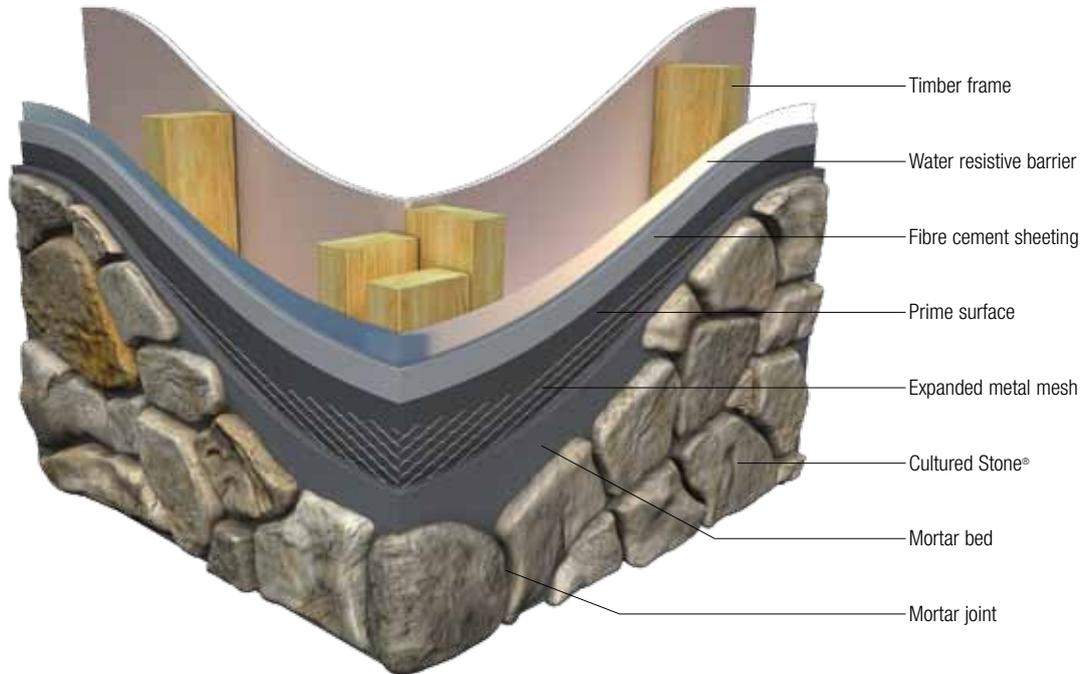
Timber Frame - Fibre Cement Clad Typical Construction (Dwg # CS-01.01)
